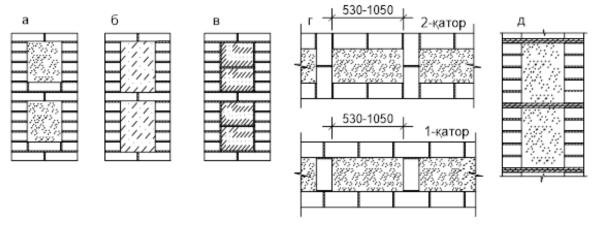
Lightened brick walls: a - filled with textile material; b - filled with lightweight concrete; v - filled with ready-made blocks; g - wall with a well; d - placement of horizontal reinforced viewing diaphragms on the well wall
